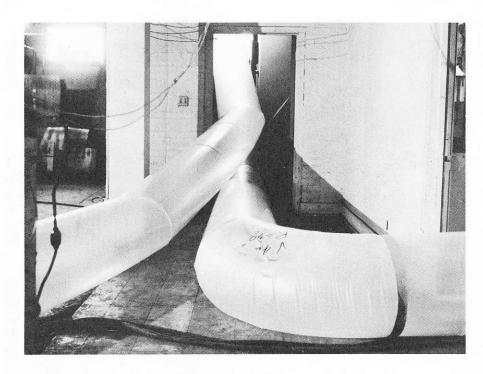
Discharge ducts leaving shelter. Fresh air enters through same opening. Two other duct systems are shown in Figures 1 and 2.
